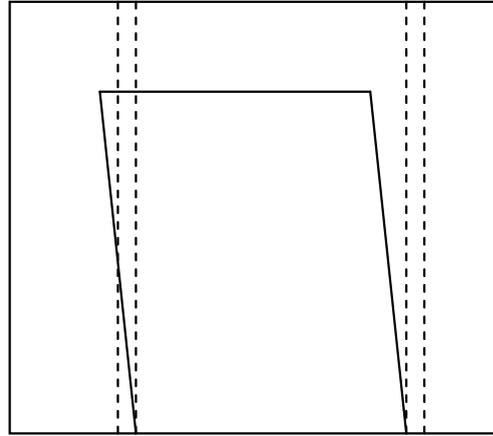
Proper track alignments when door frame is out of square (drawing not to scale).
